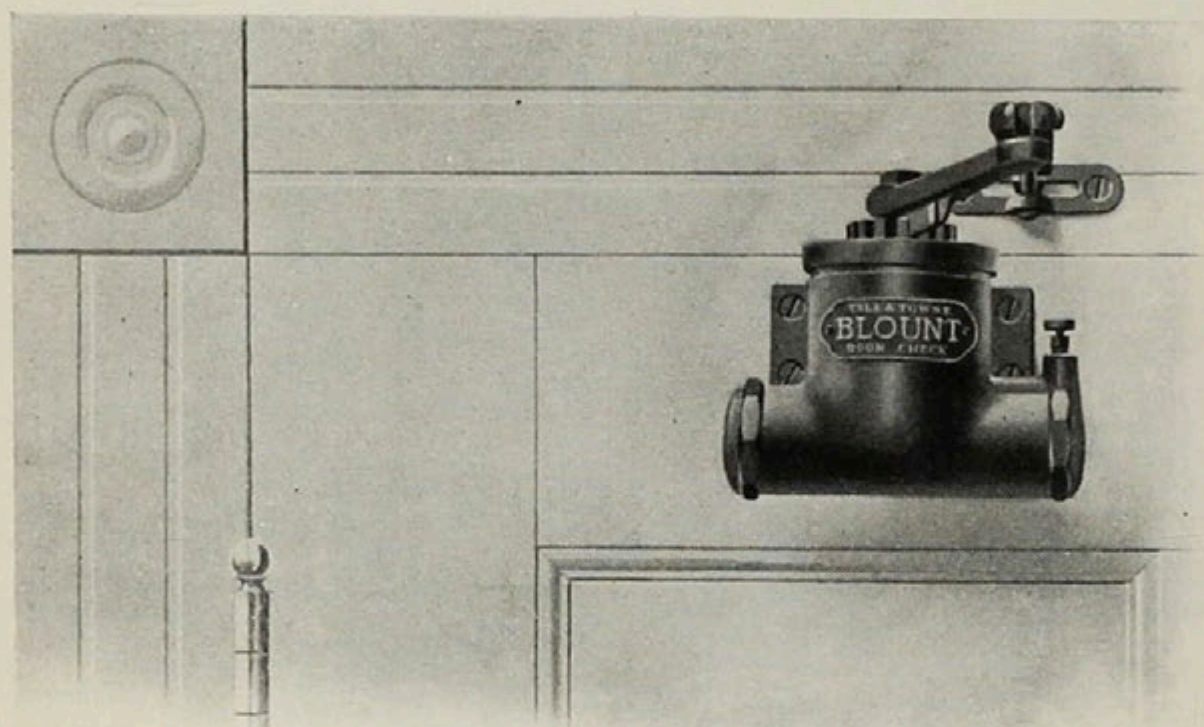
Right-hand Door From Inside. Use Right-hand Check.
